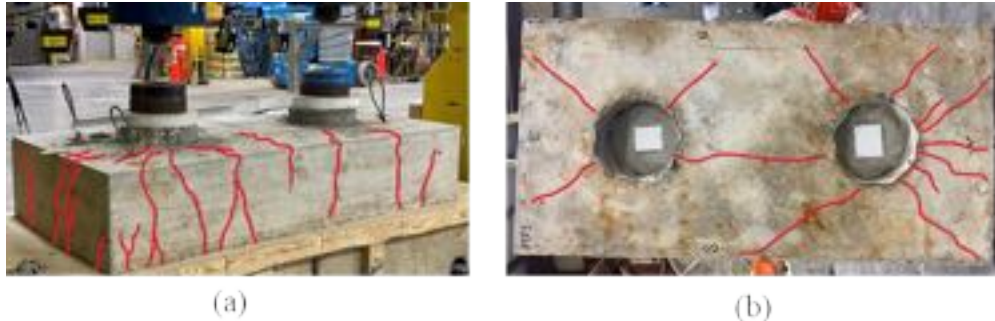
Cracking after testing on (a) south-west view and (b) bottom of specimen MP-1.
